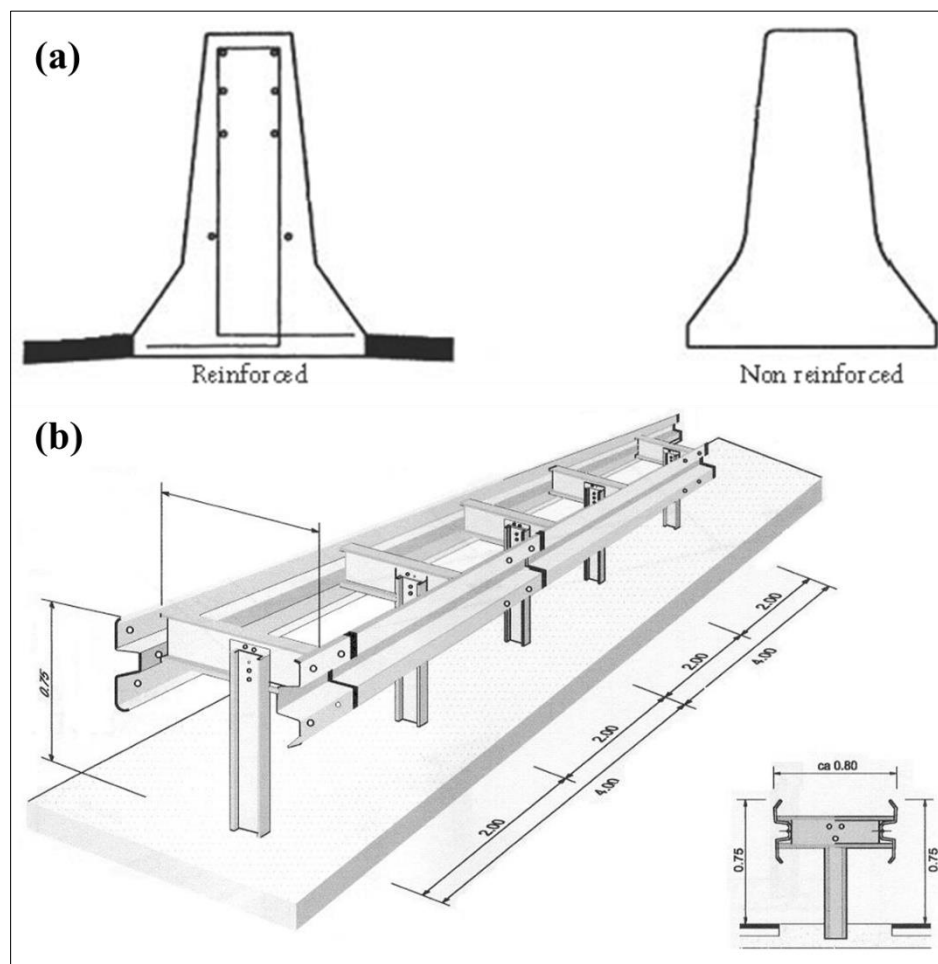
Examples of guardrails (a) concrete (b) steel (GDH, 2005)
